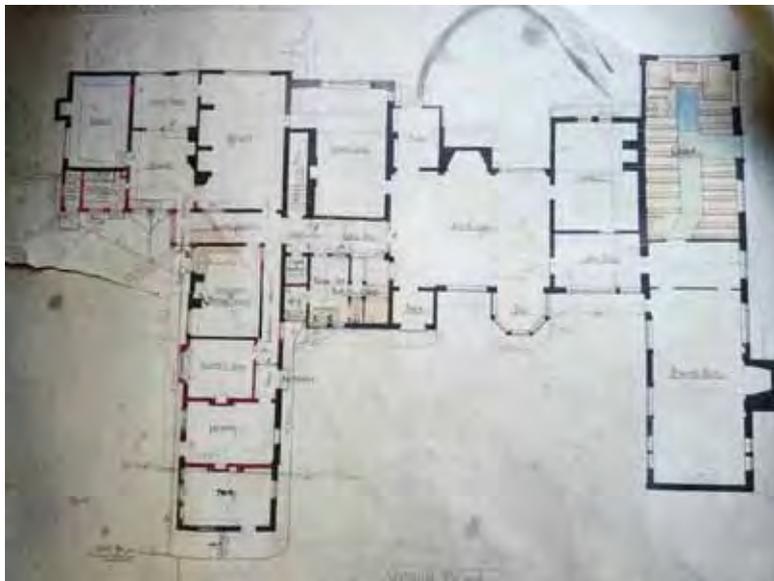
Ground floor plan of the 1880s, with red areas indicating proposed alterations in the N and NE wings (Stockport Council)
